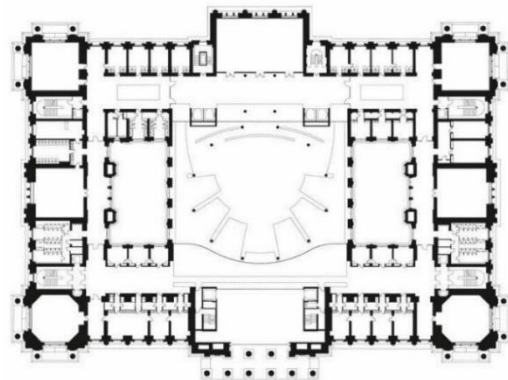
shows the building architectural plan of the Reichstag new parliament with the addition of the internal glass walls.
